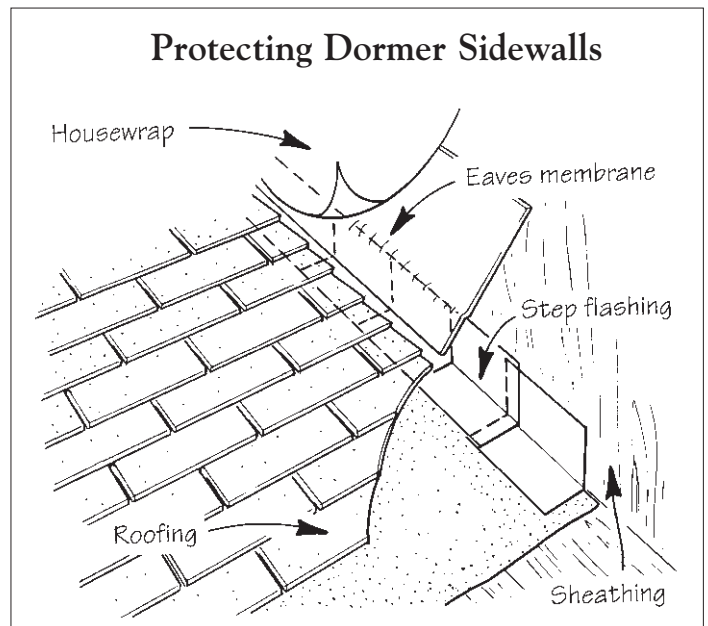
To protect dormer sidewalls, make sure the step flashings are installed behind the housewrap. At areas where water accumulates, the author lifts the housewrap and adds a strip of self-adhering eaves membrane over the step flashing.
